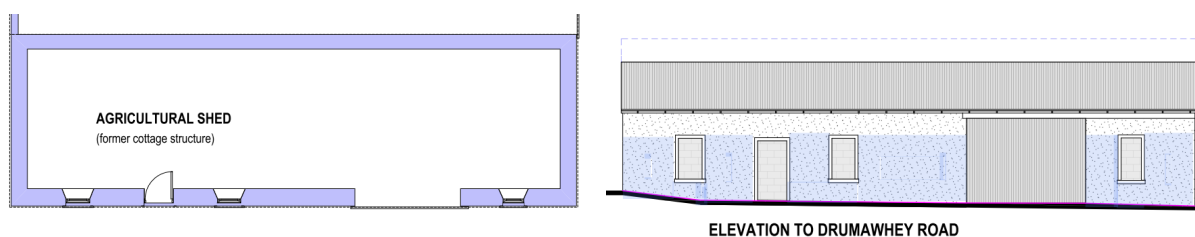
Extracts from Drawing (LA06/2024/0771 03B) showing original cottage walls, and existing front elevation to Drumawhey Road with shading in blue illustrating walls to be permanently retained.
